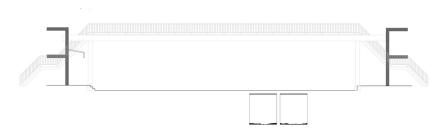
Street profile of the current situation facing the northwest (upstream). The underground storm drain is located on the right side of the street.
